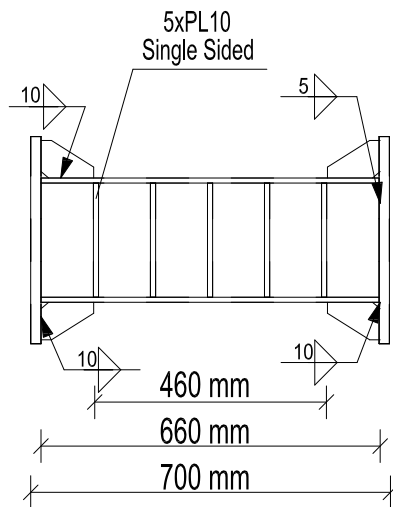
Technical drawings of specimens LCF1-LCF3
